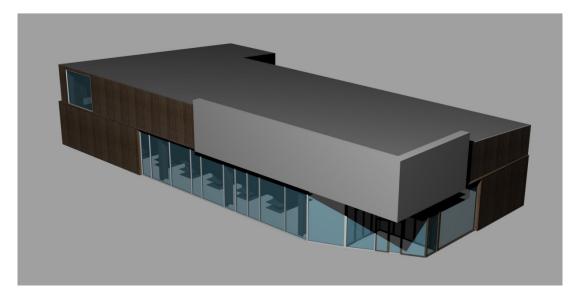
Case Study #5 – Predominately Timber Single-Storey Retail Building
